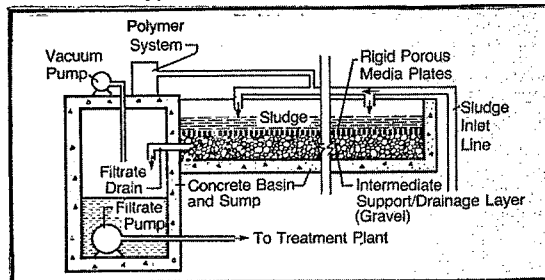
Typical Section of Vacuum-Assisted Sludge Dewatering Bed
